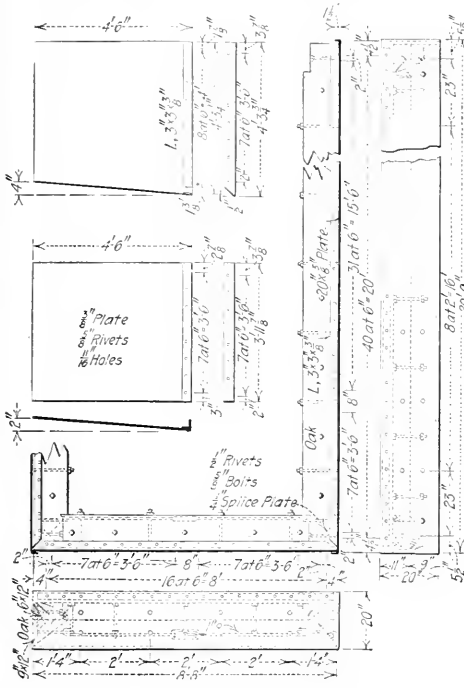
DETAILS OF NEW STEEL SINKING SHOE
